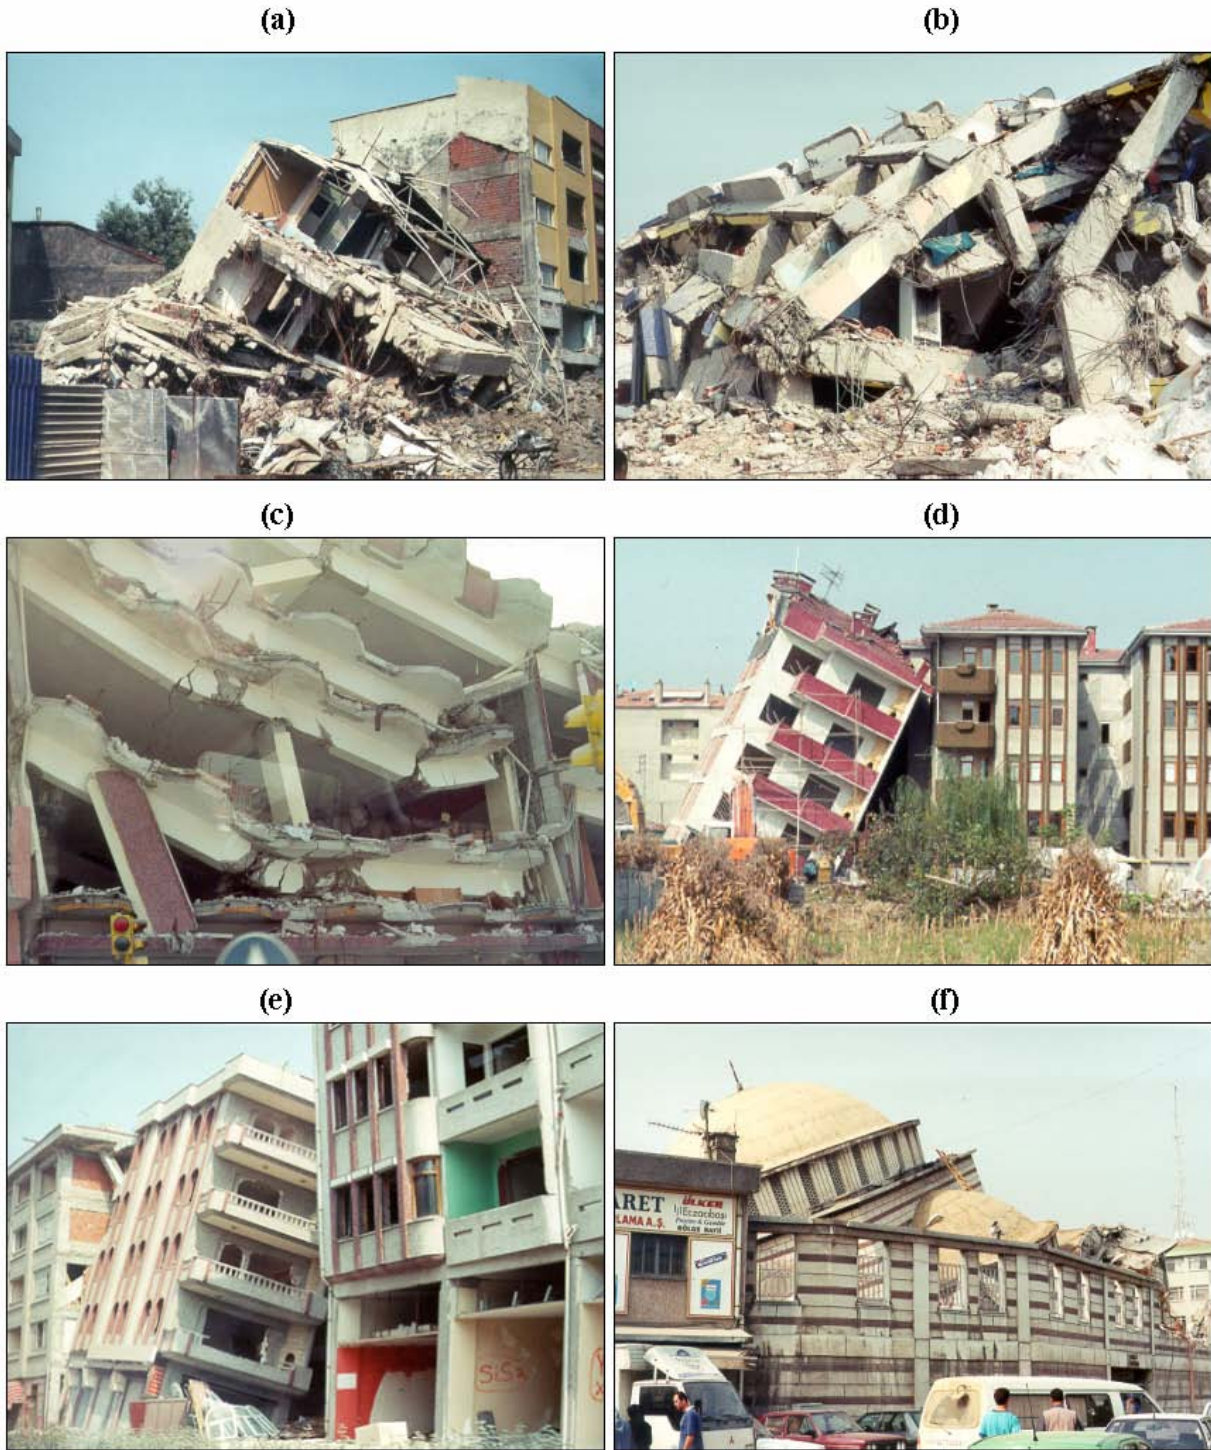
Photo mosaic, showing damage sustained in Adapazari during the Marmara earthquake: (a-b) extensive building collapse; (c) building collapse through pancaking of the floors; (d-e) severe tilting caused by collapse of the first floor; (f) building damage extends beyond residential structures to include religious centers. Building damage such as this is recorded as changes in optical and SAR remote sensing imagery, acquired before and after the earthquake.
